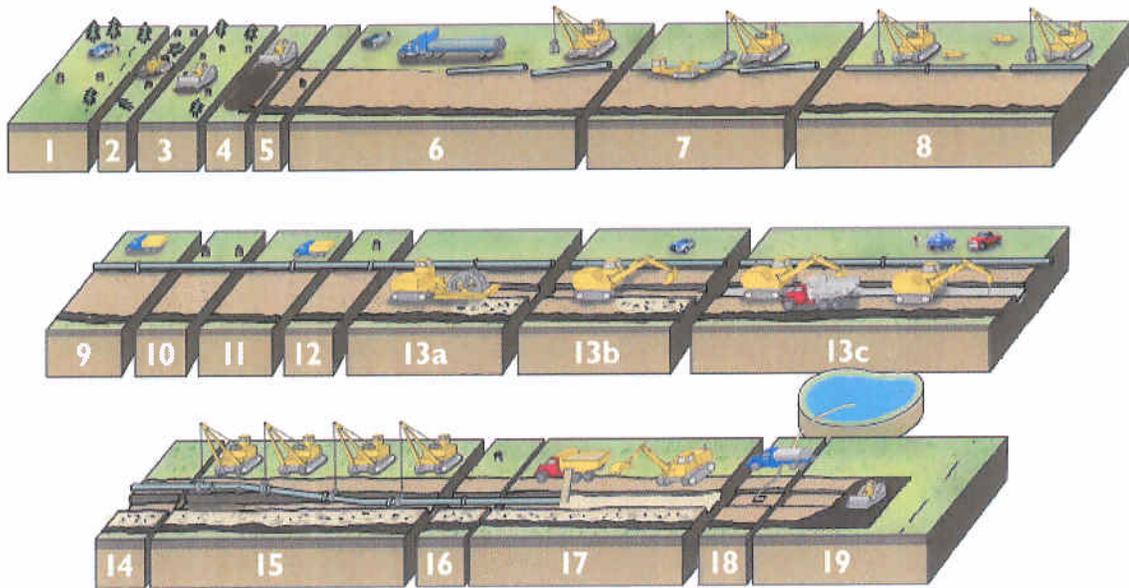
Typical R.O.W / Trench Construction Detail
